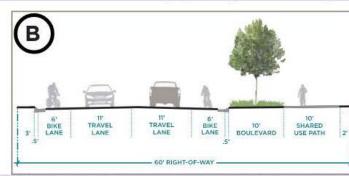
Preferred Alternative East Broadway Segment 'B' Typical Section Looking East
